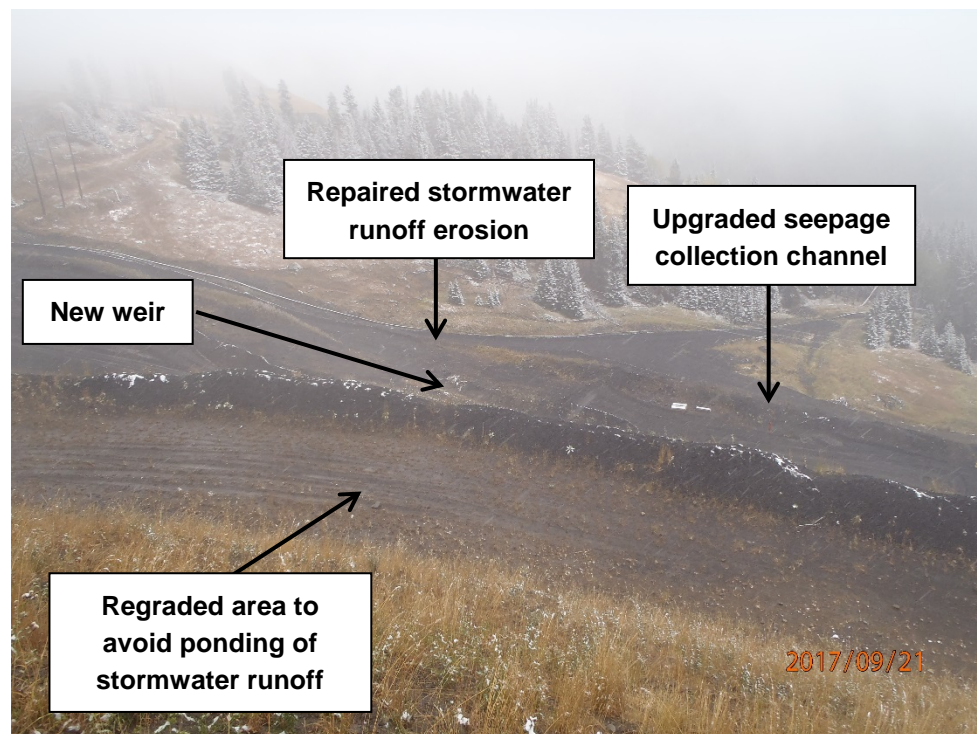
Main Dam – west abutment, looking west. 21 September 2017.
